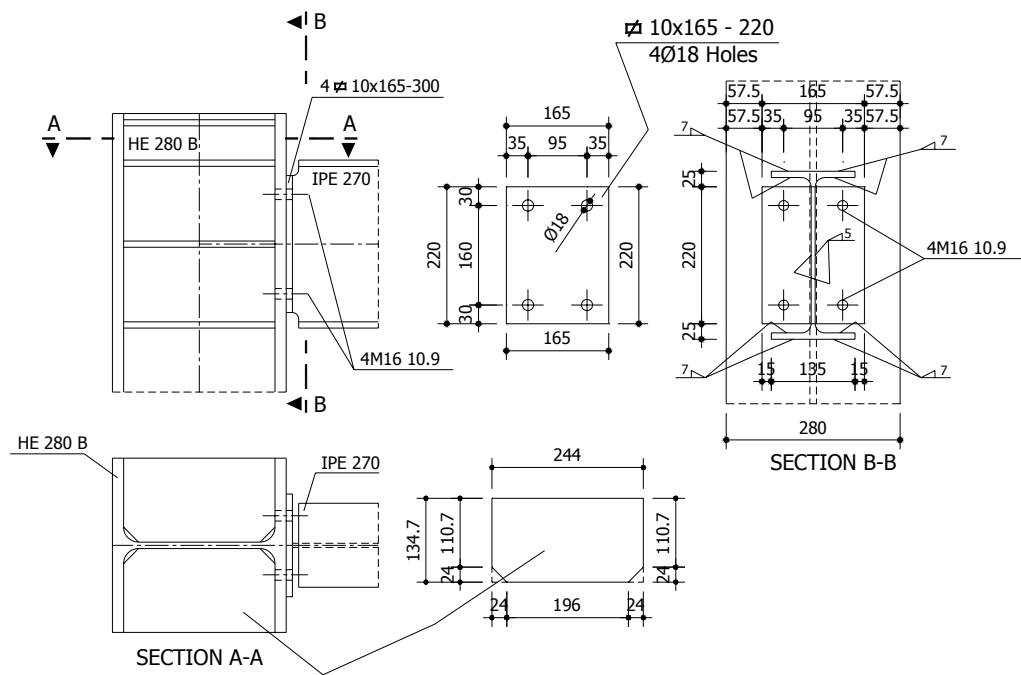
Beam-to-Column Joint Detail with Header Plate (dimensions in mm)
